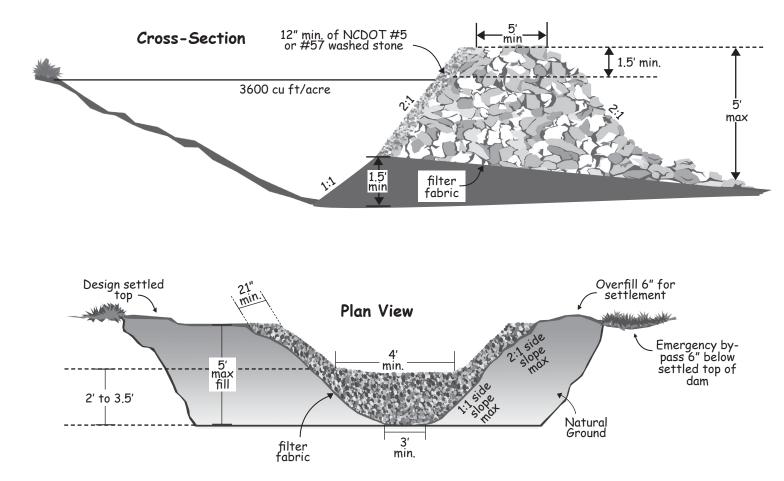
Plan view and cross-section view of a temporary sediment trap.
